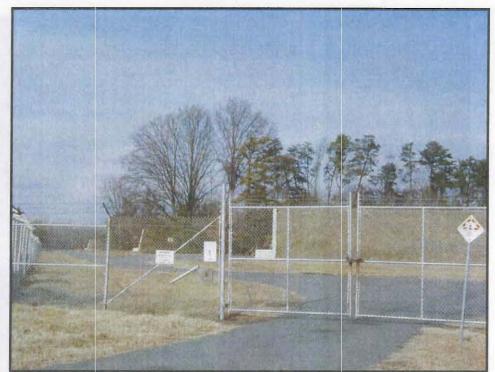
View toward Igloo Magazines, located in Magazine Area One - Mainside.
